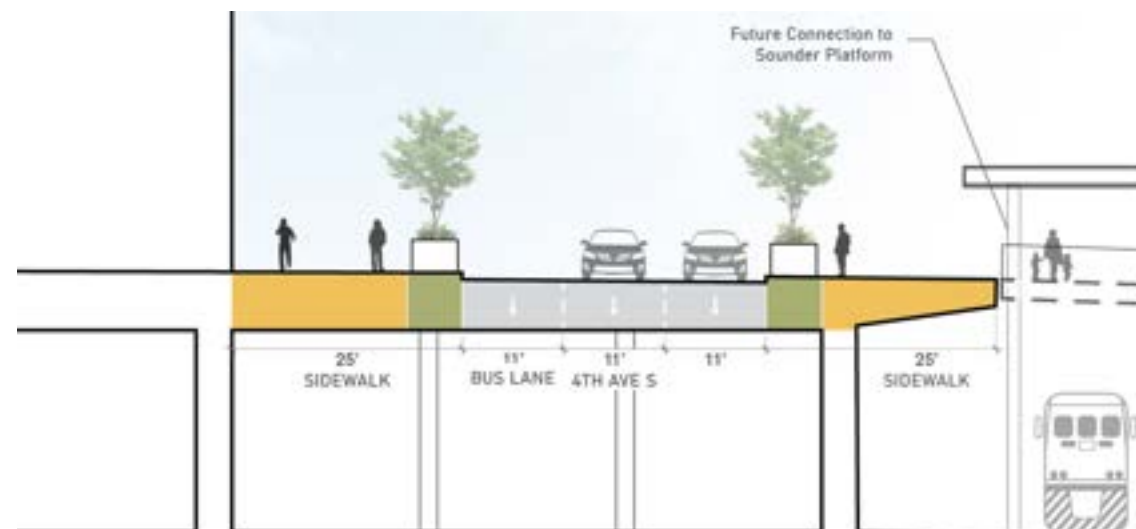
Stitch Focus Area: Section BB'. Illustrative street section at 4th Ave S where a new pedestrian connection to the existing Sounder Platform is proposed, including expanded sidewalks and planting buffers.
